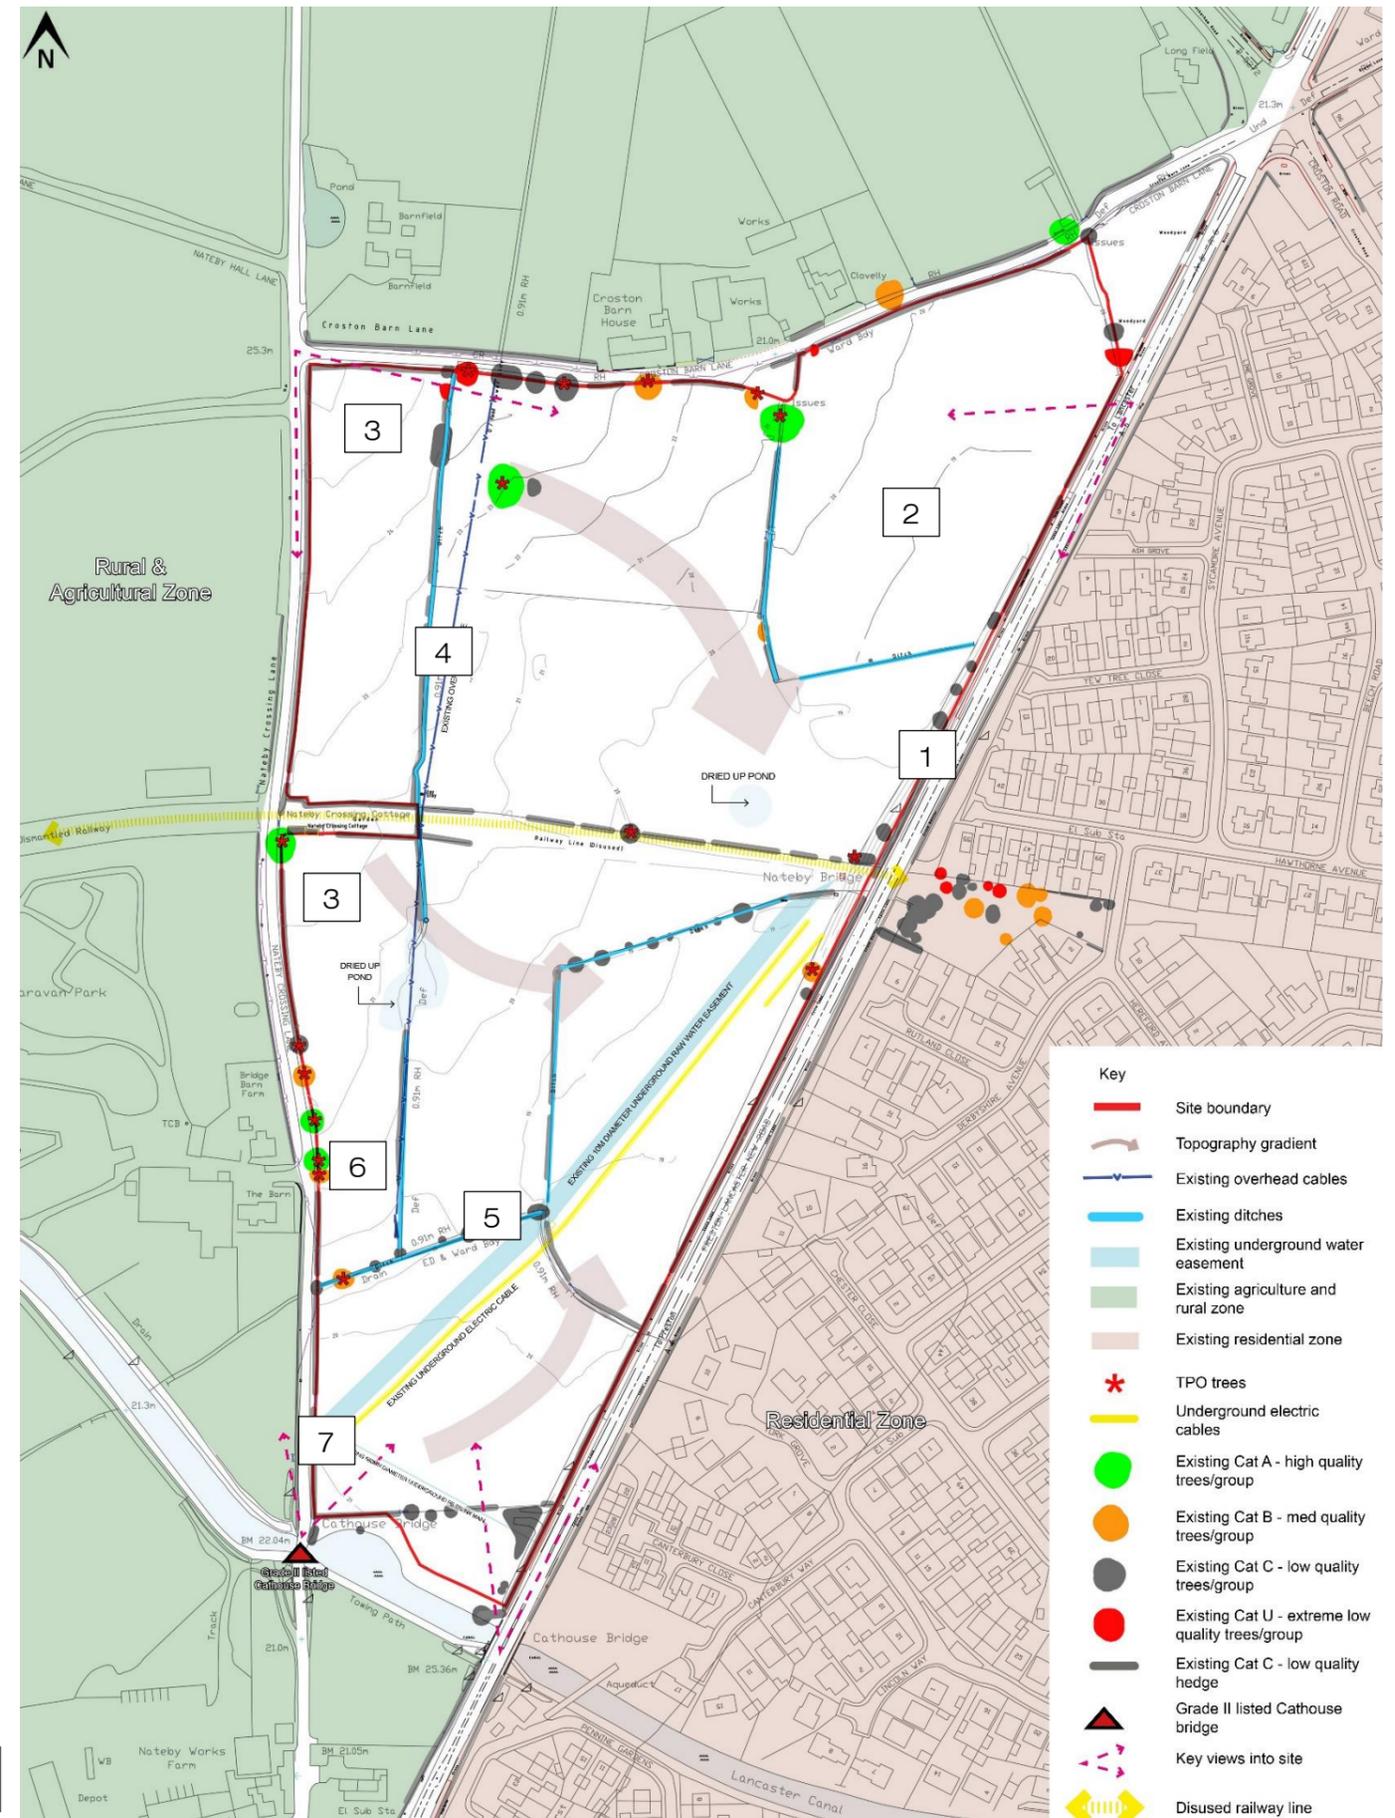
Constraints Plan (refer full plan to Appendix A)
